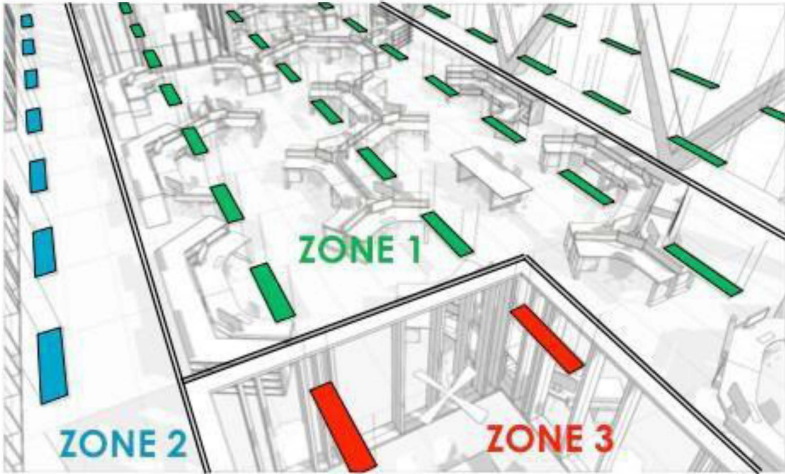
A TYPICAL OFFICE LAYOUT WITH NEW ZONES CREATED
